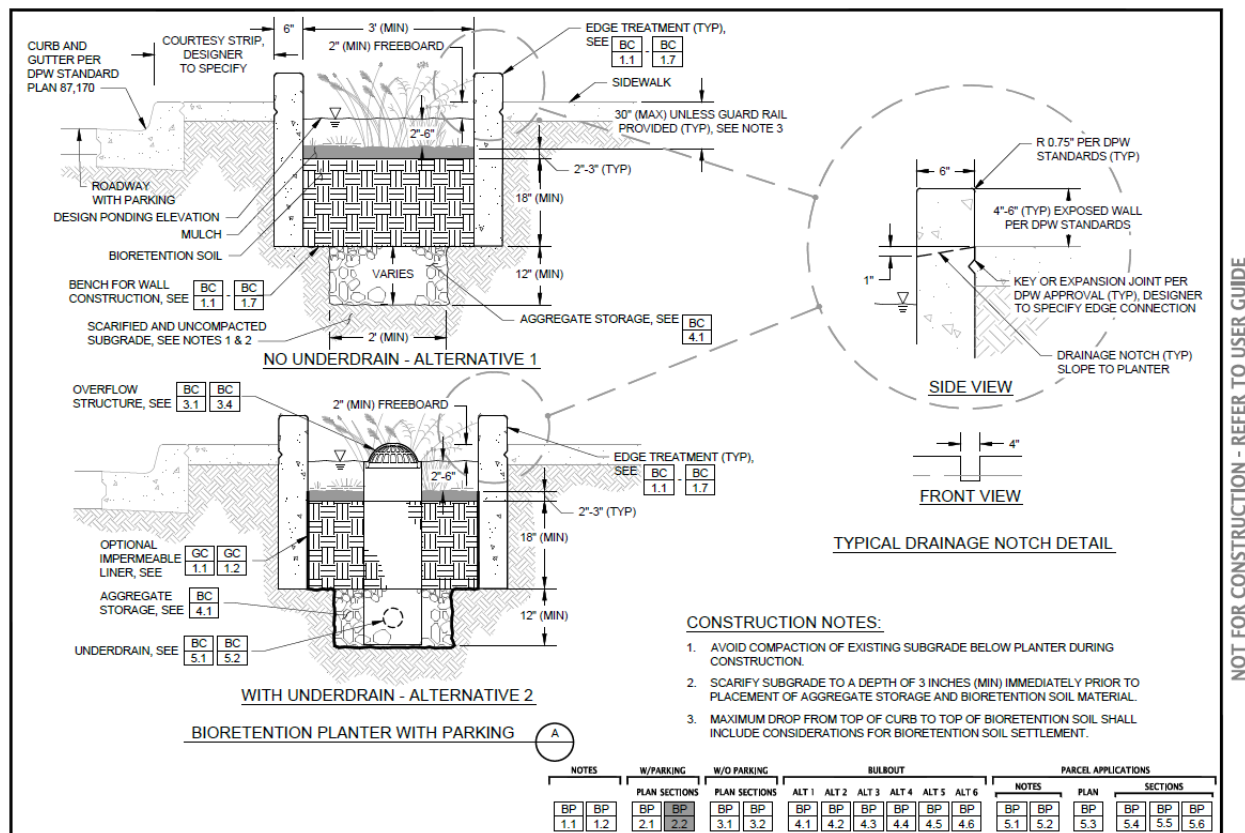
Example of Typical GI Detail in SMCWPPP GI Design Guide
